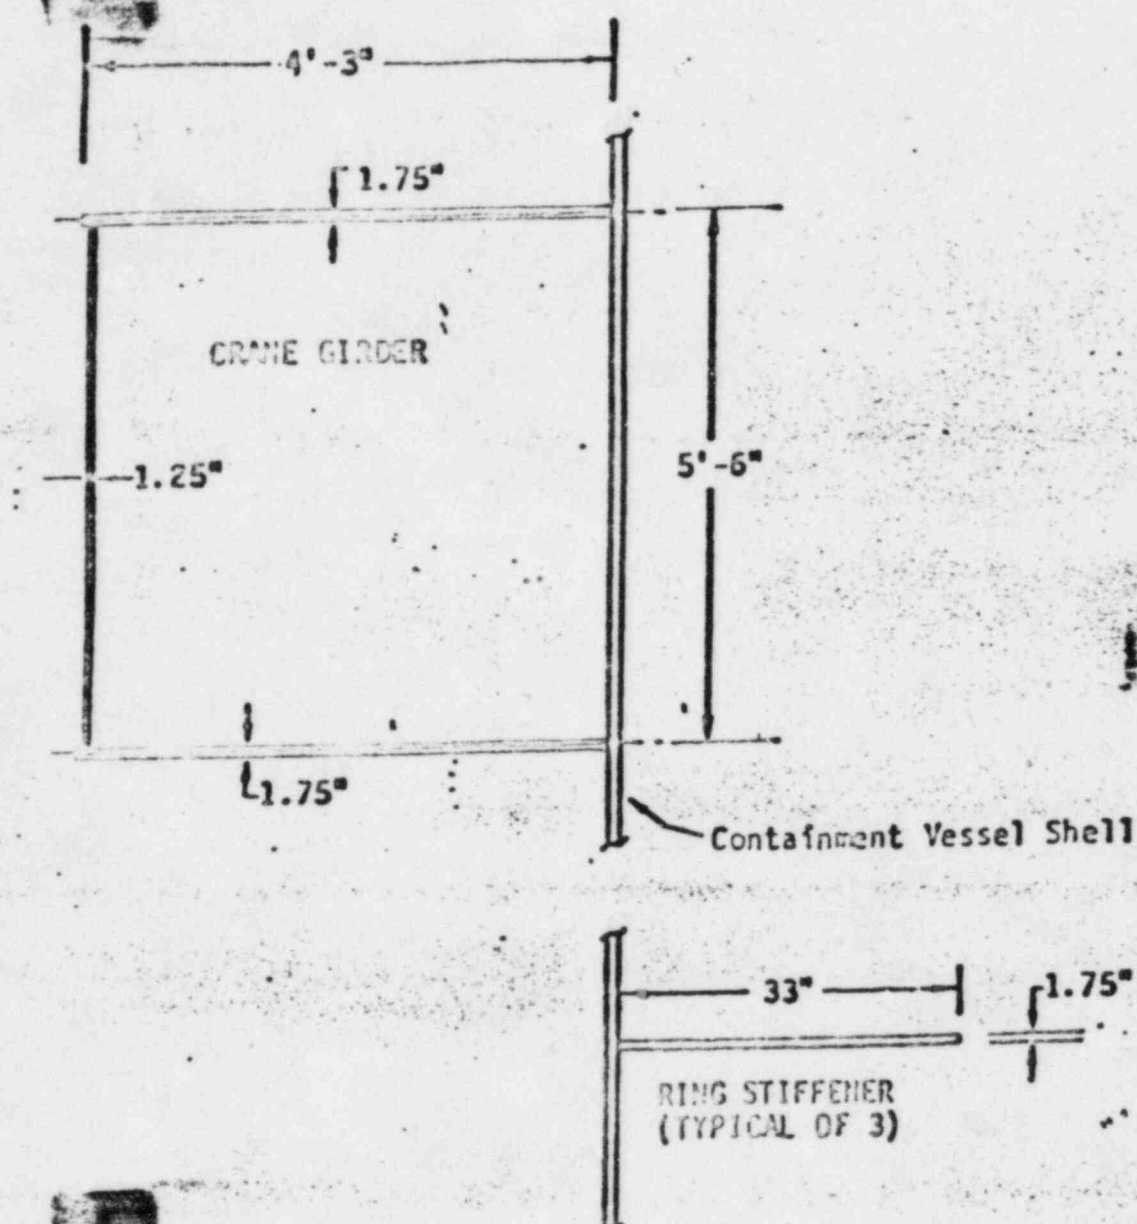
Detailed Geometry of Ring Stiffeners and Crane Girder
